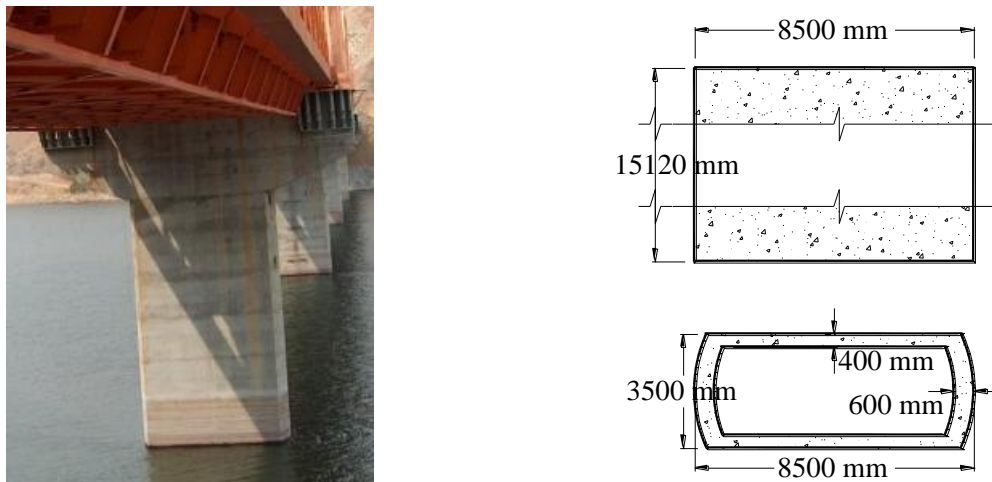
Wall type reinforced concrete piers of the Infiernillo II Bridge
